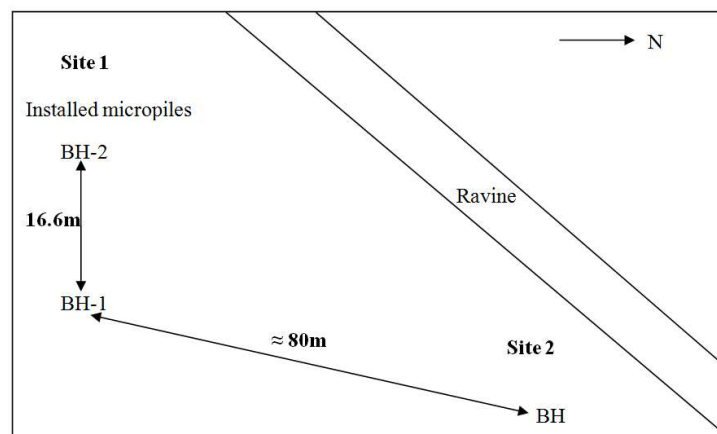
2. Plan view for the layout of Site 1 and Site 2
